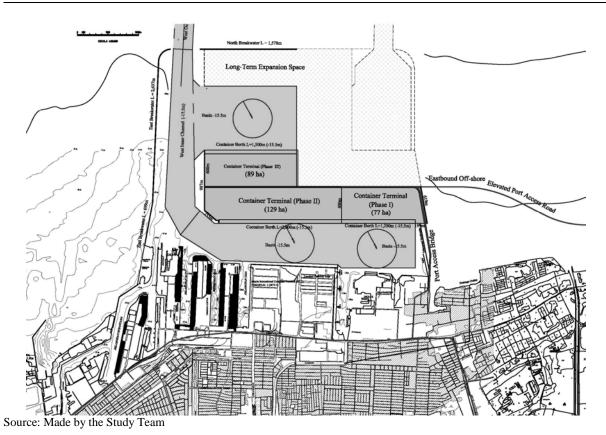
Facility Layout Plan of North Kalibaru Expansion in 2030 (Alternative-1)
